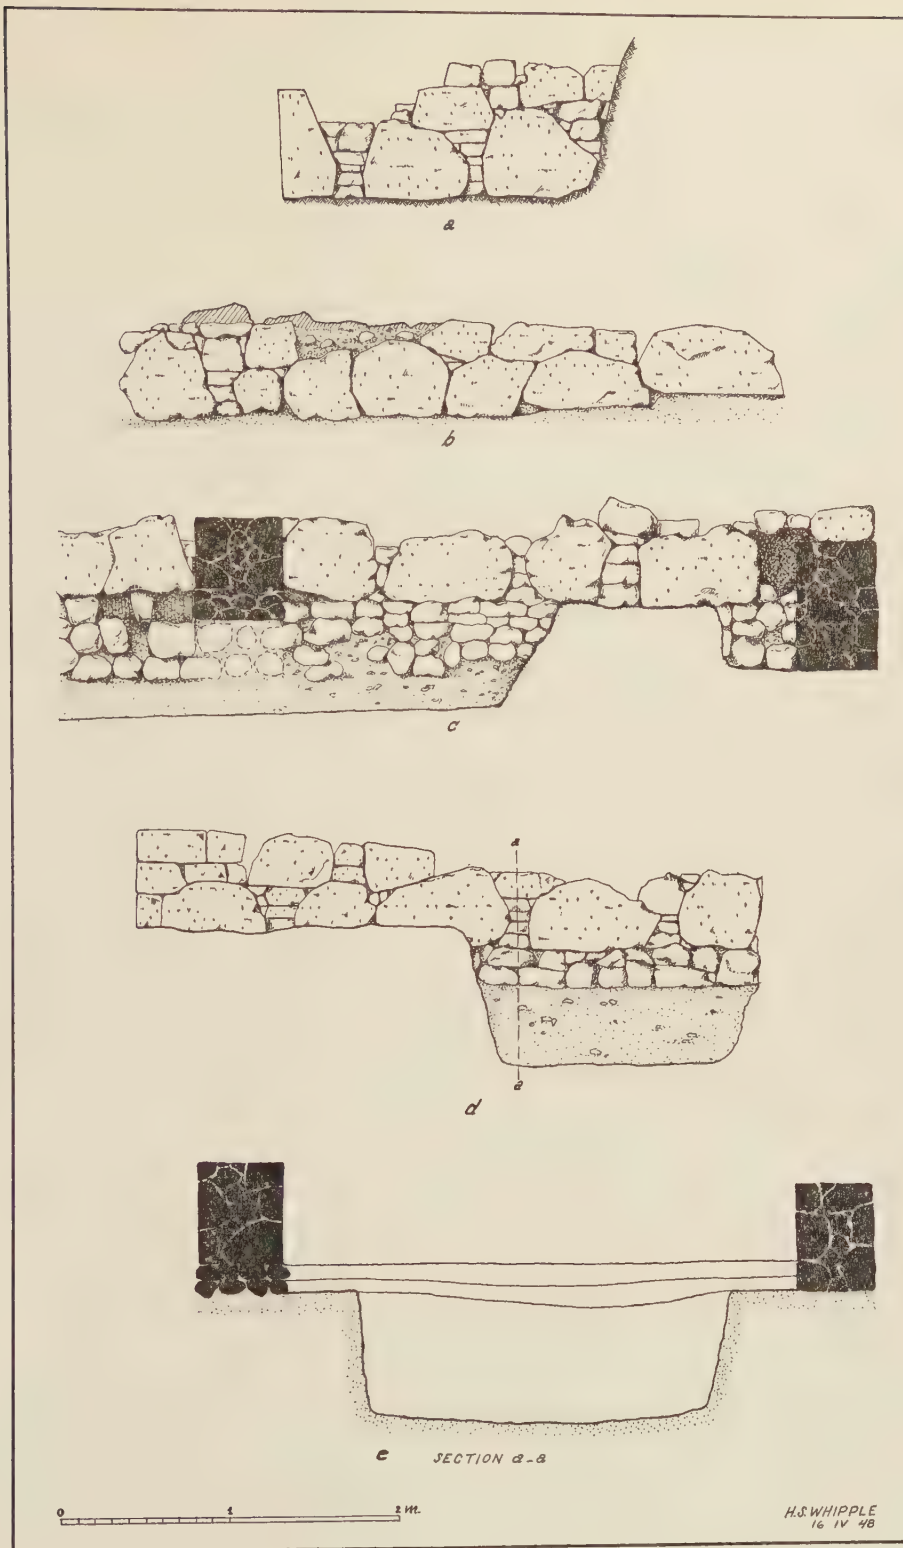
House K: Elevations of Walls and Section through Northwest Room.
